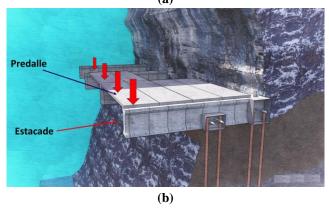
Estacade beam and bolted connection placed to be connected to micro piles
